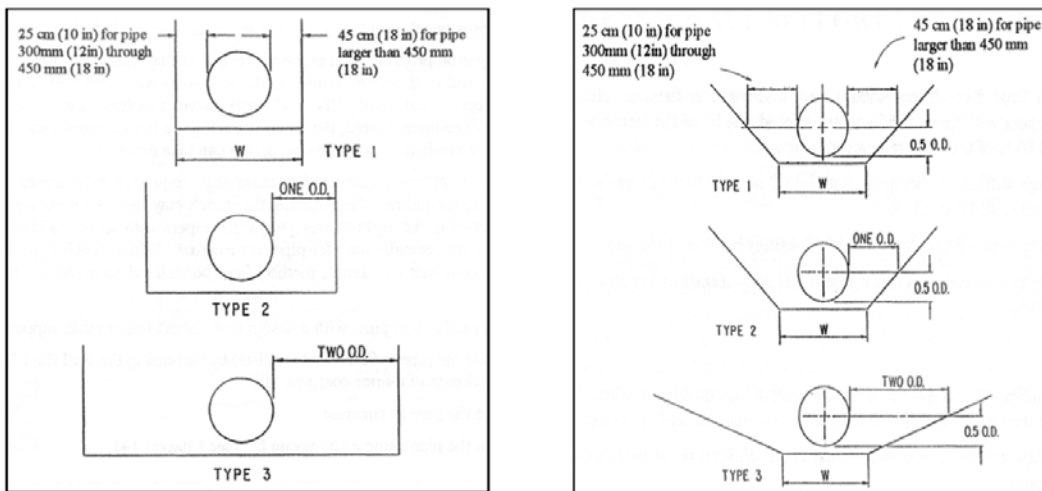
Site Clearances for Trench Walls: a) Vertical Trench Wall and b) Sloping Trench Wall. (O.D. is outside pipe diameter) (Hashemi, 2008)
